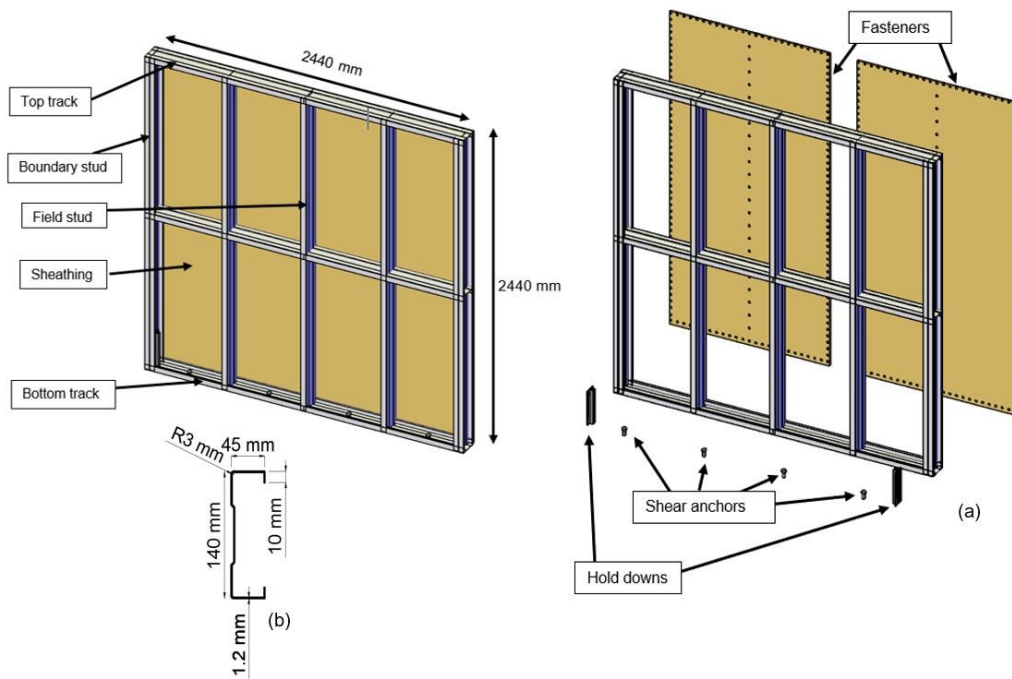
(a) General framing details of wall panels; (b) CFS section used for wall panel tracks and studs
